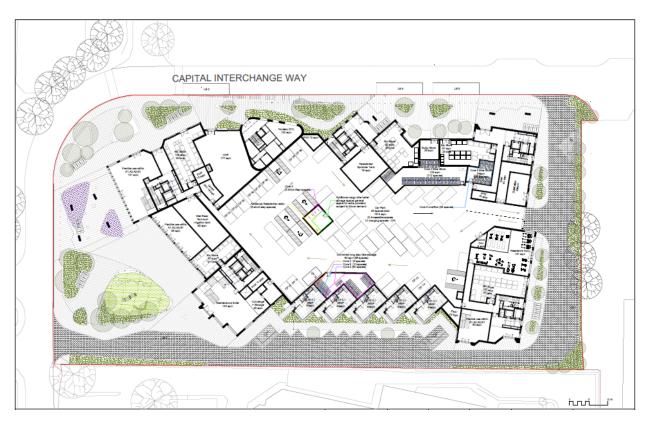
proposed groundfloor plan (1699_DWG_PL_XX_20_100_rev05)
